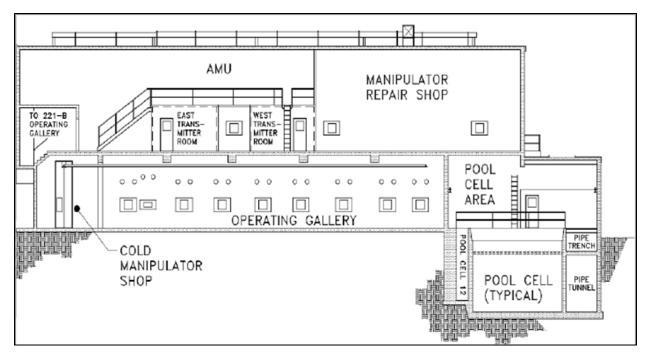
Waste Encapsulation and Storage Facility 225-B Building East/West Sectional View
